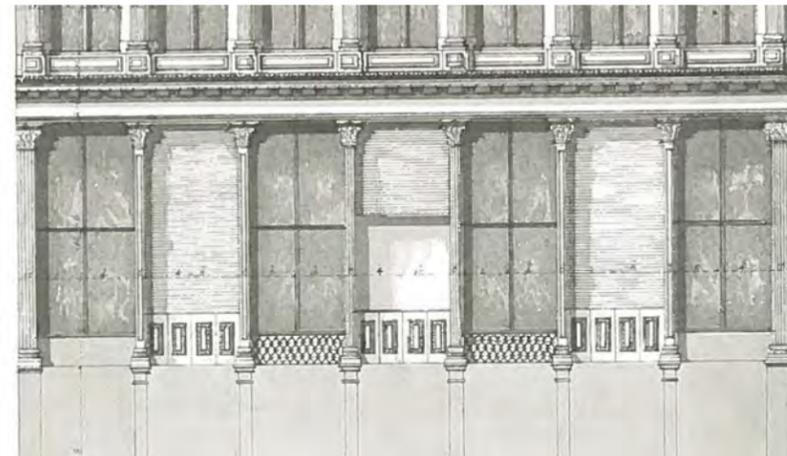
PLATE XXVI STOREFRONT OF MCGREGOR BUILDING, NEWARK, NJ
